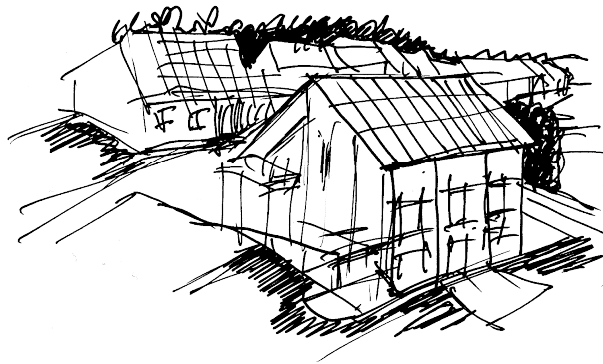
On the roof of the building, solar panels form the plane of the roof.
